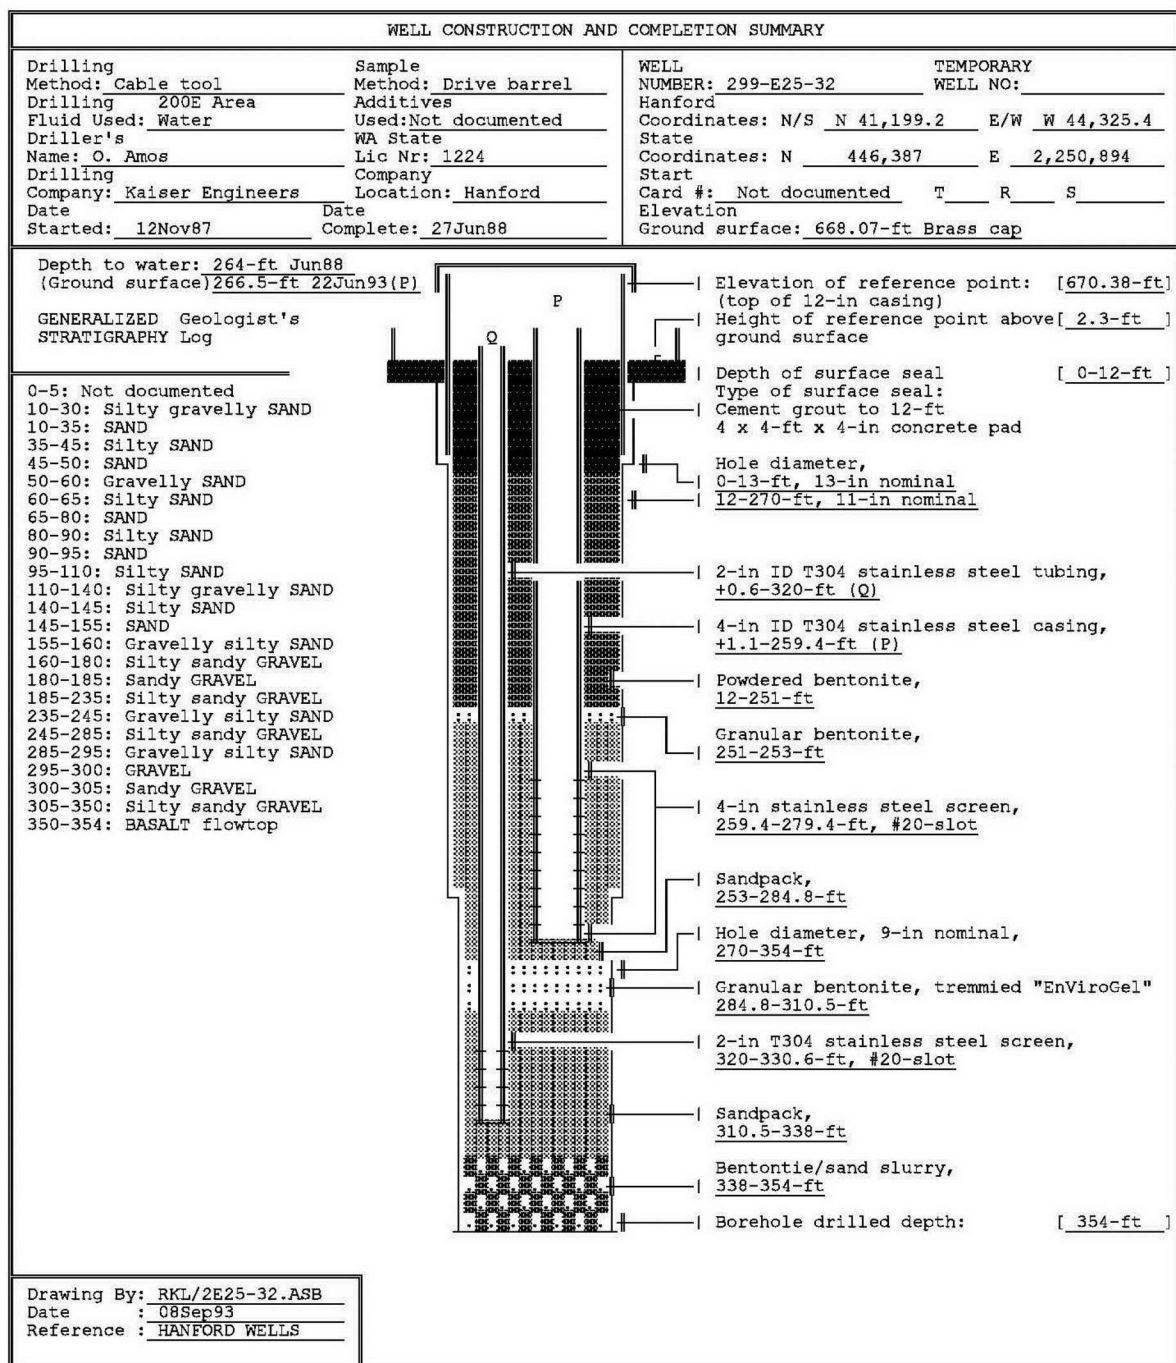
Well 299-E25-32P Construction and Completion Summary
